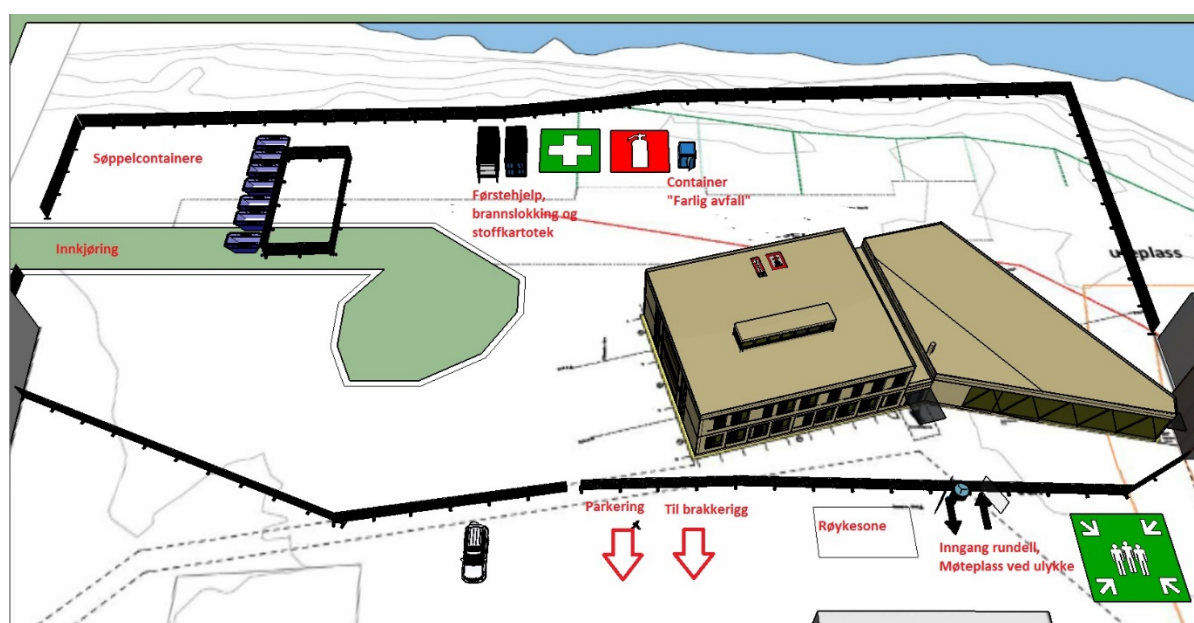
Aerial plan of the construction rig, courtesy of ØM Fjeld AS/Statsbygg.
